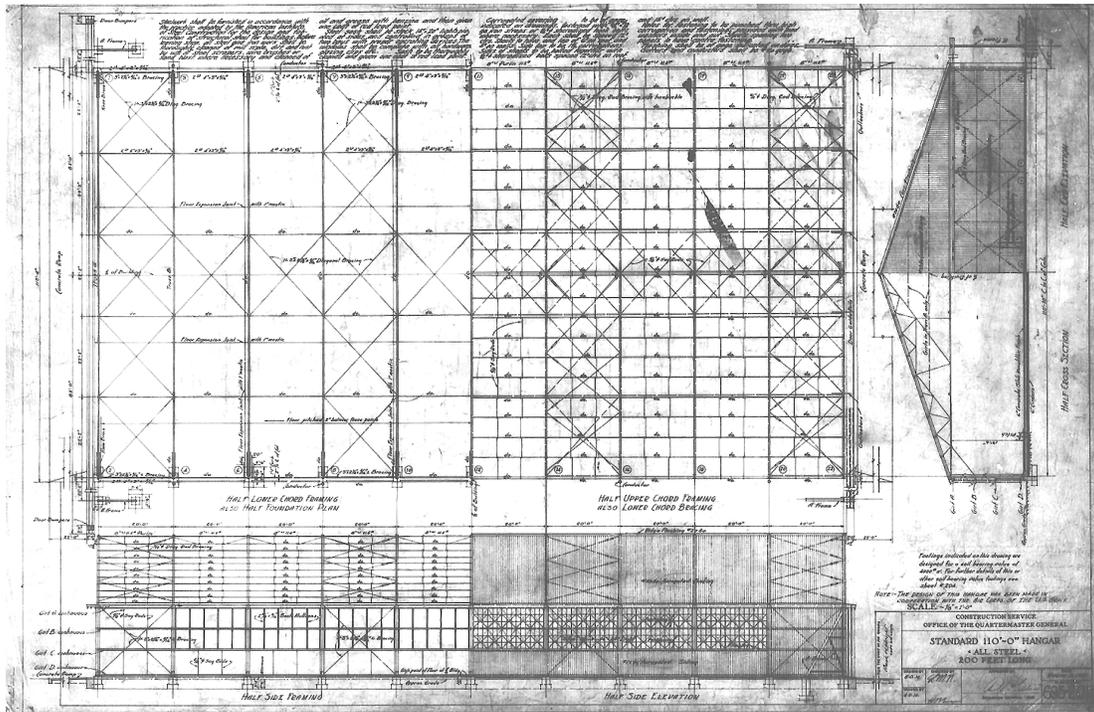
Plan No. 695-201, Standard 110 x 200 Foot "All Steel" Hangar, late 1920s.
